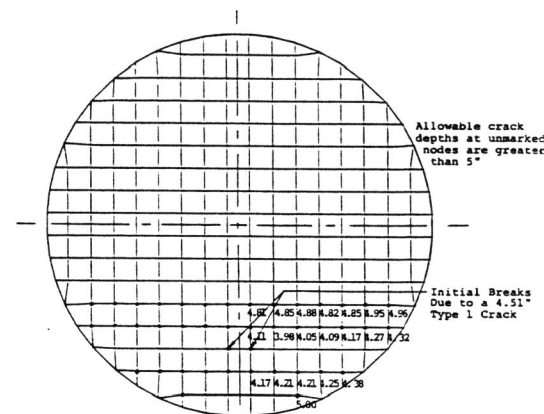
Size of Type 1 Crack Required to Produce a Second Beam Failure Assuming the First Break Occurs at a Beam With a Type 1 Crack of 4.51 Inches
